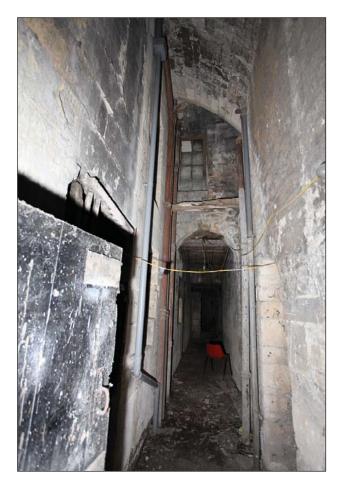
Sub-basement 10 Bridge Street. Line of Slippery Lane and high level window viewed from the east.
